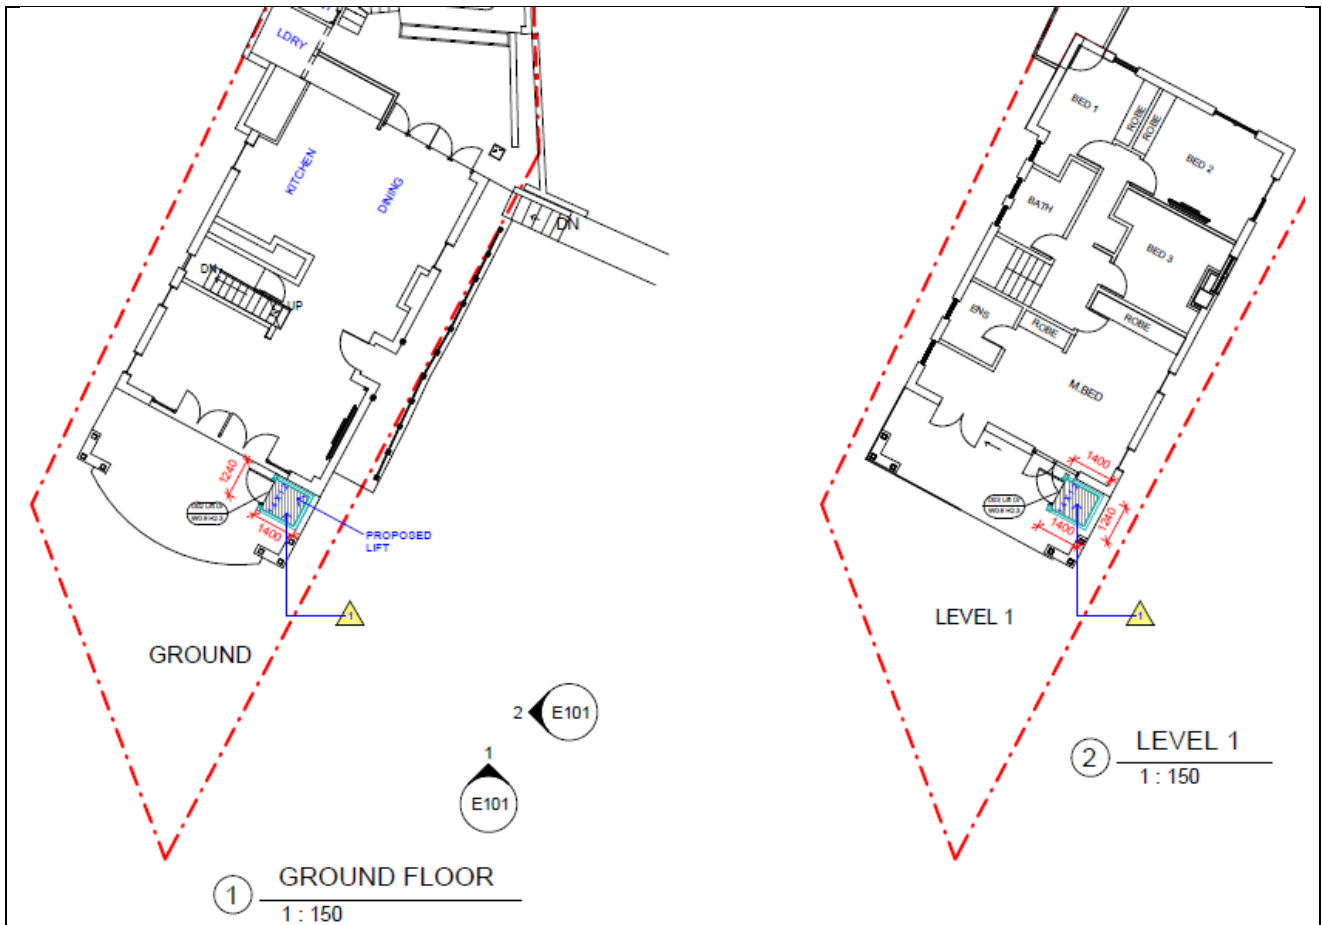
Proposed ground floor and level 1 floor plans (Source: Architectural Plans)
